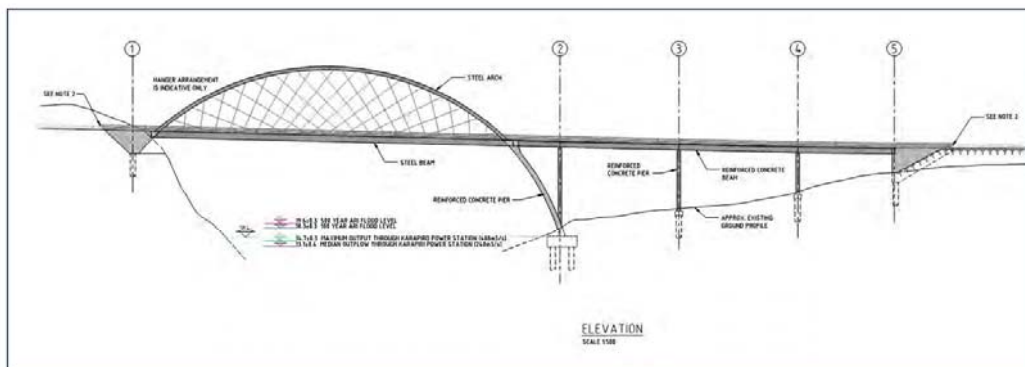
Conceptual elevation, Hamilton Gardens bridge (Tied arch shown – final form subject to detailed design)
